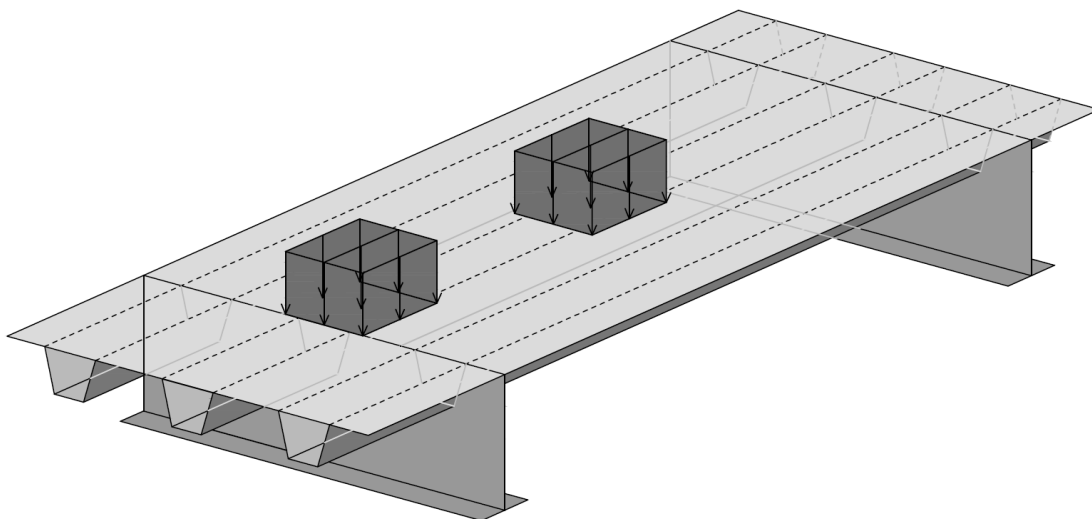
First load axle placed in the centre of span between floor beams and the second 1.2m towards the floor beam 7
